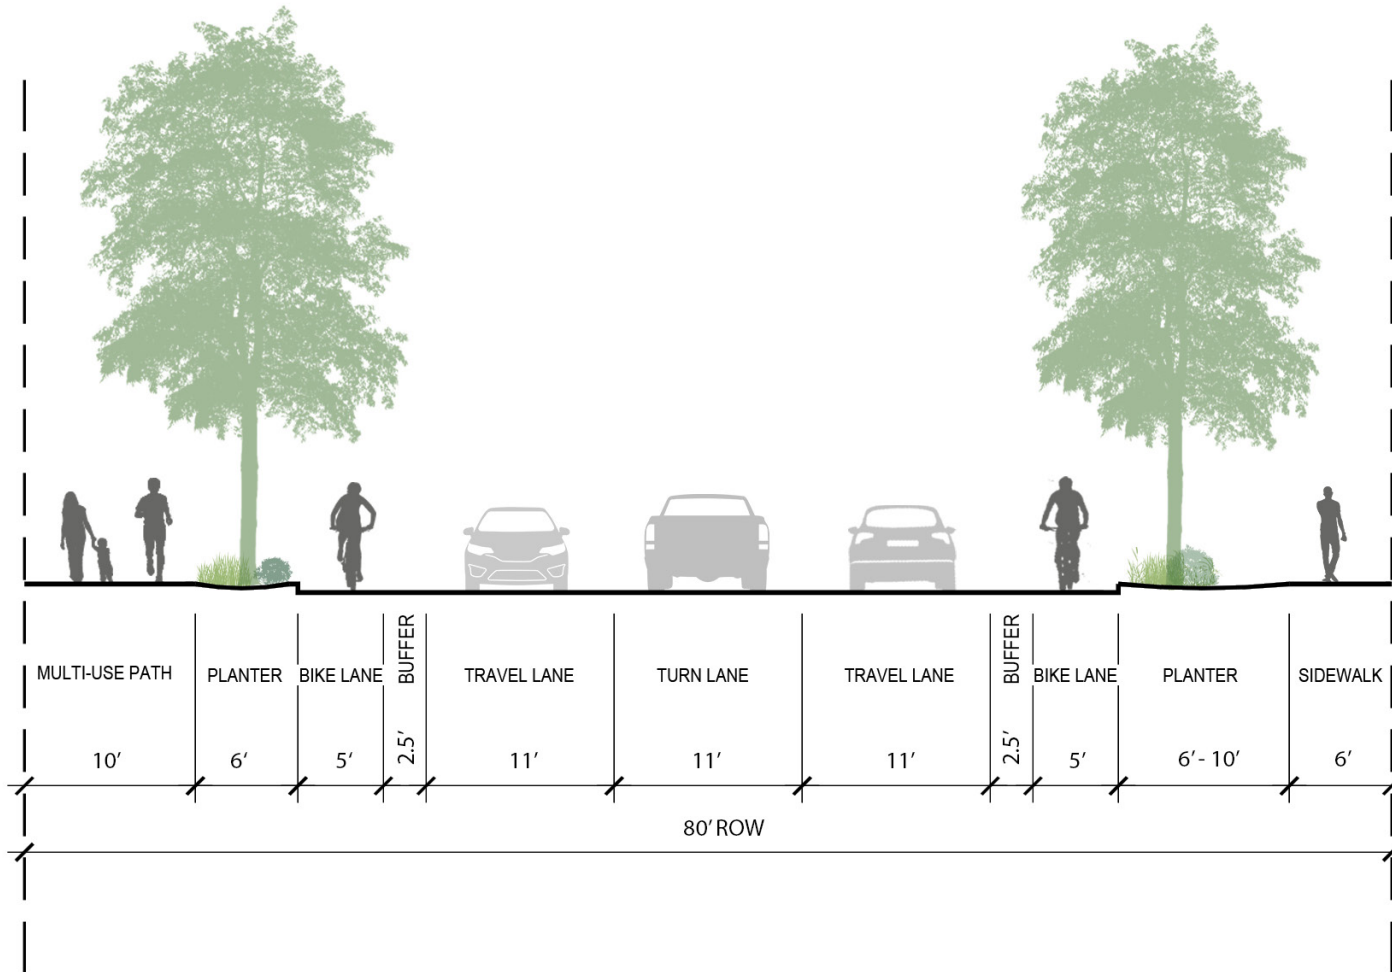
Example Alternative Collector Cross Section - Mixed Use Context
